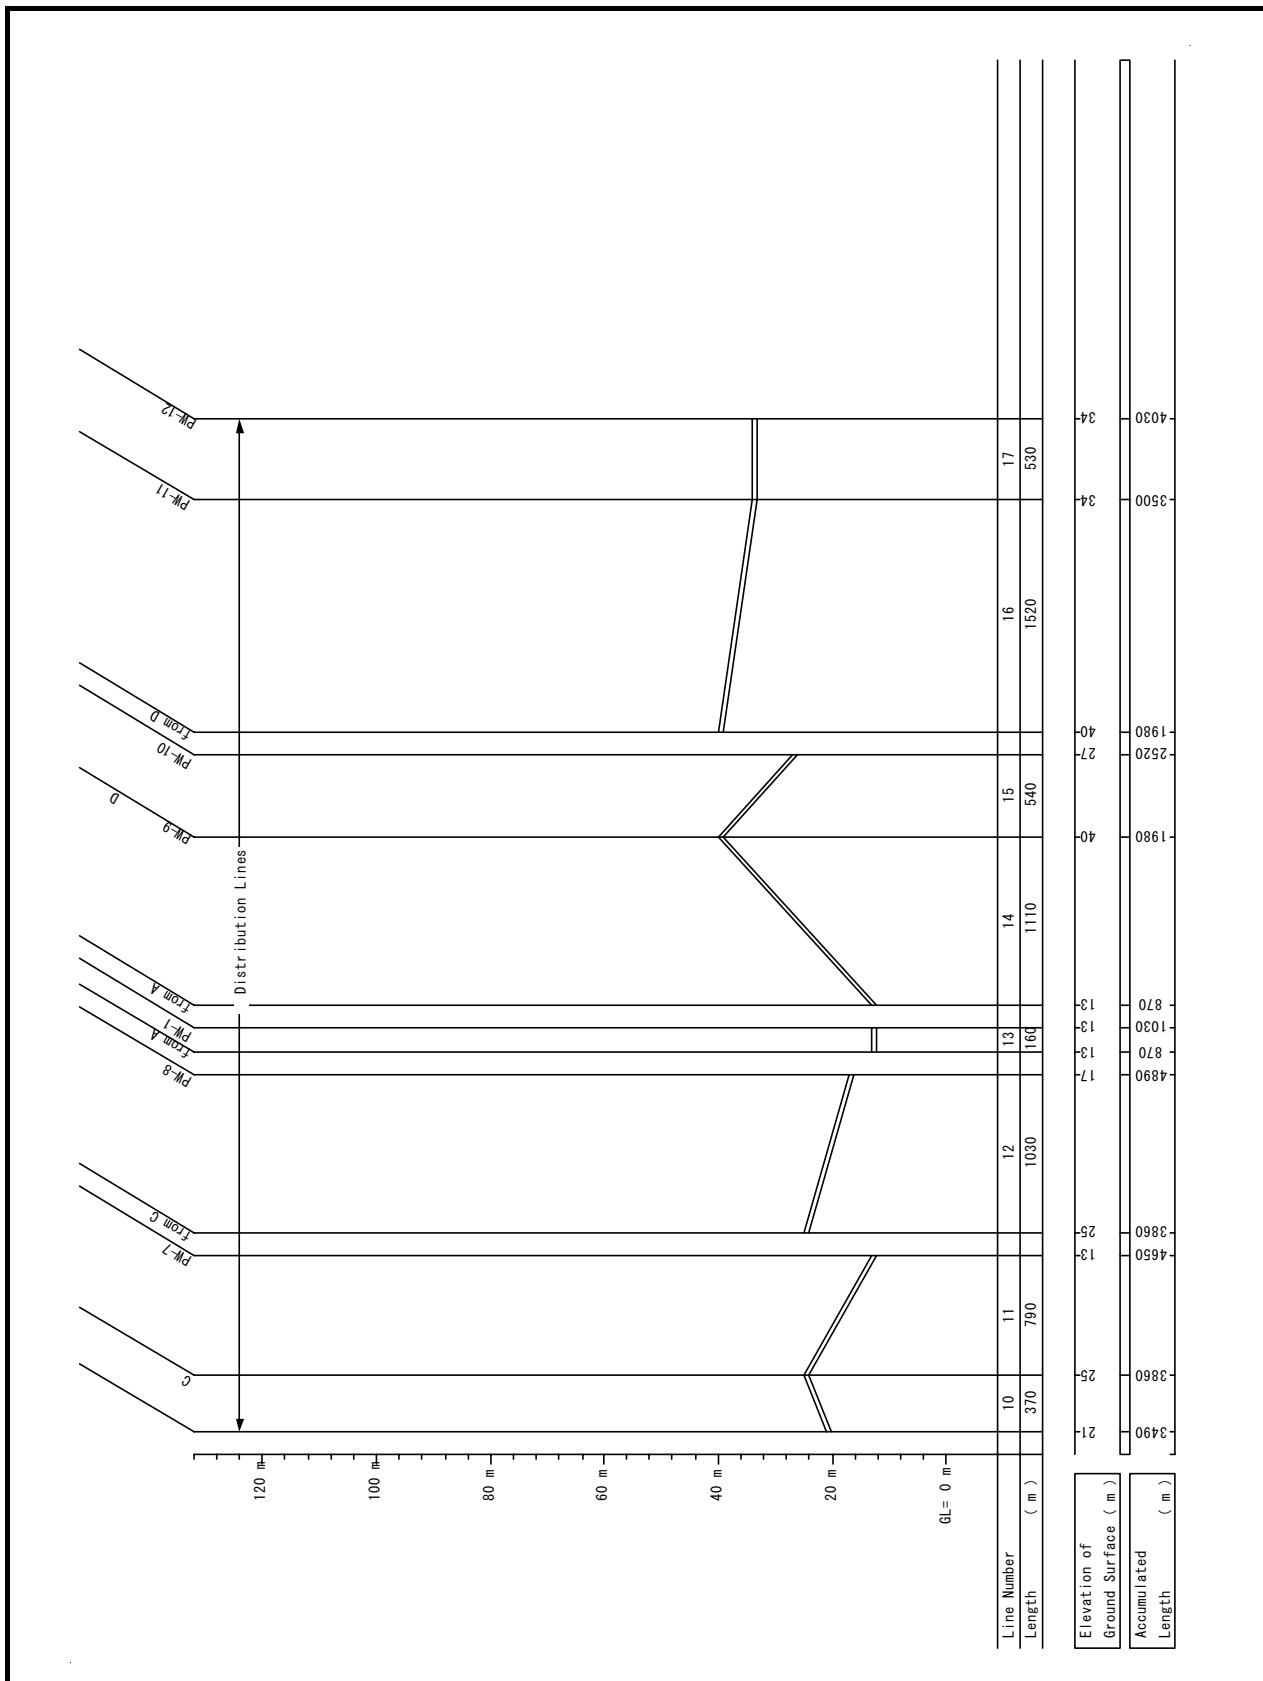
LONGITUDINAL SECTION ( PUGU STATION: 17/22)
